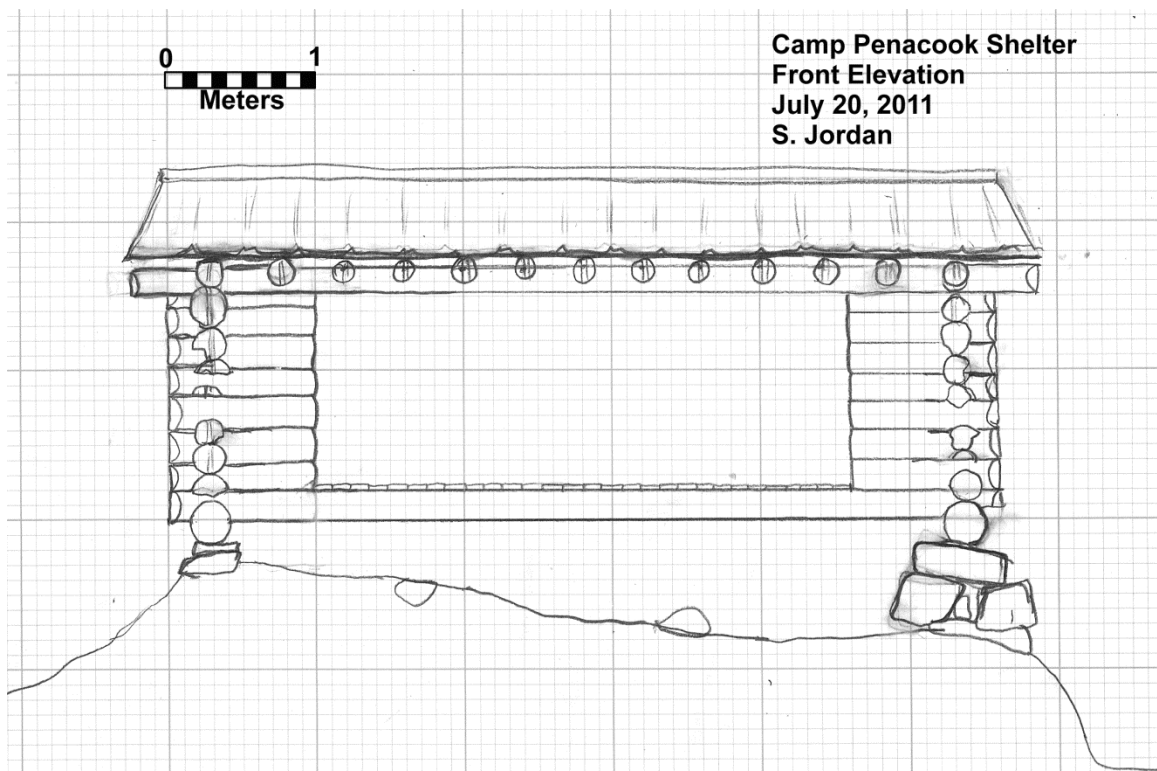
Camp Penacook shelter drawing. Southeast (front) elevation. July 20, 2011.
